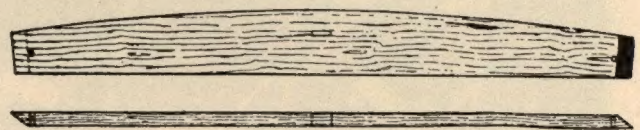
Typical lamella. Note angular cuts, bolt holes, and circular cut of top to conform with roof curvature
